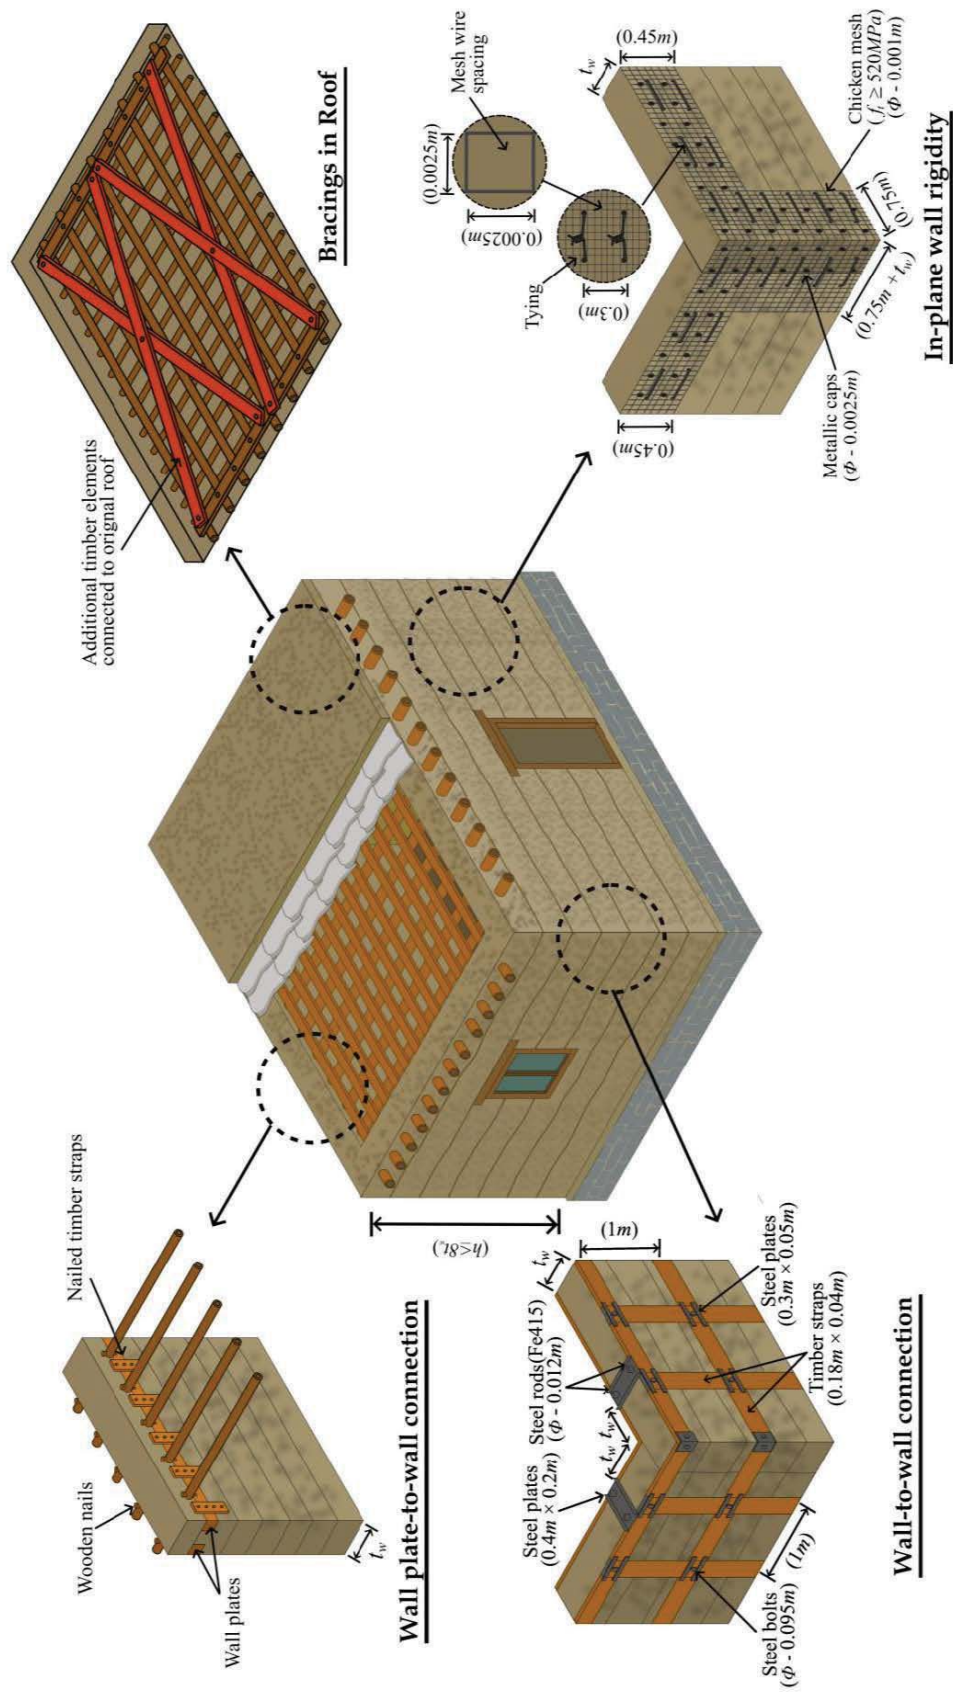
Suggested safety measures for existing rammed earth buildings
